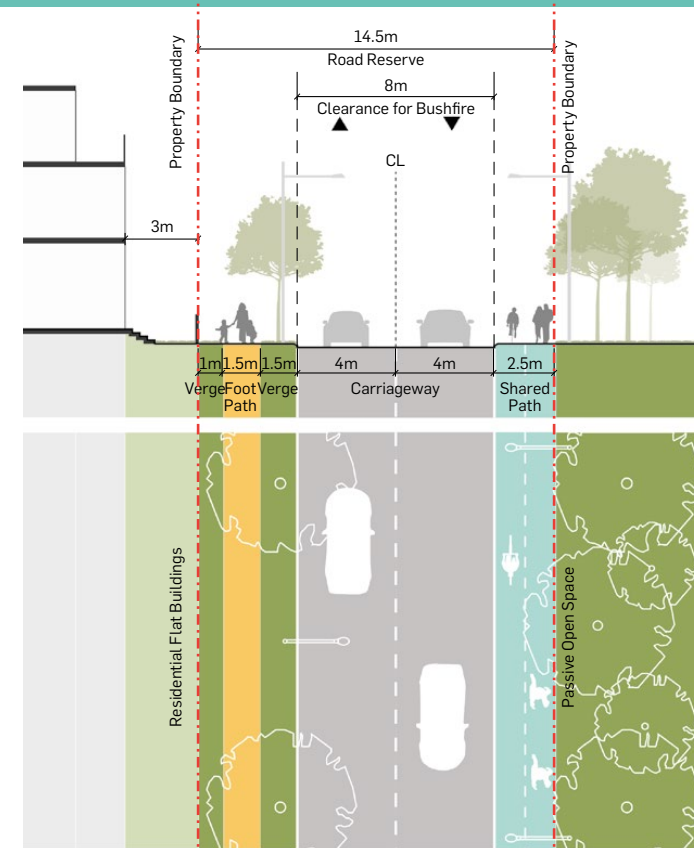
Indicative Street Section F-F' - Access Place - Bushfire Compliant
